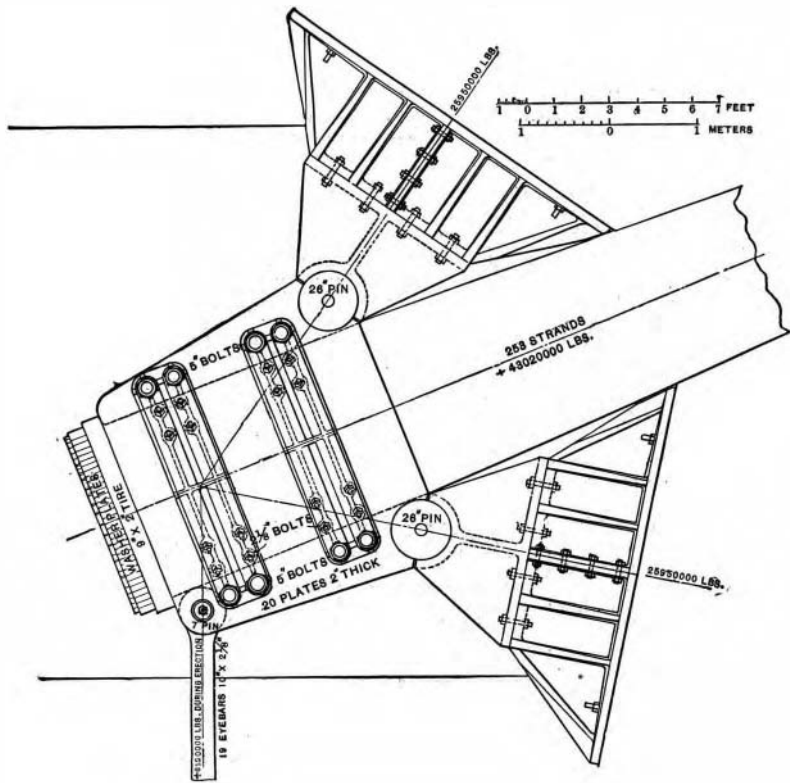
PLATE IV.—METHOD OF FASTENING BACKSTAYS AT ANCHORAGES.
